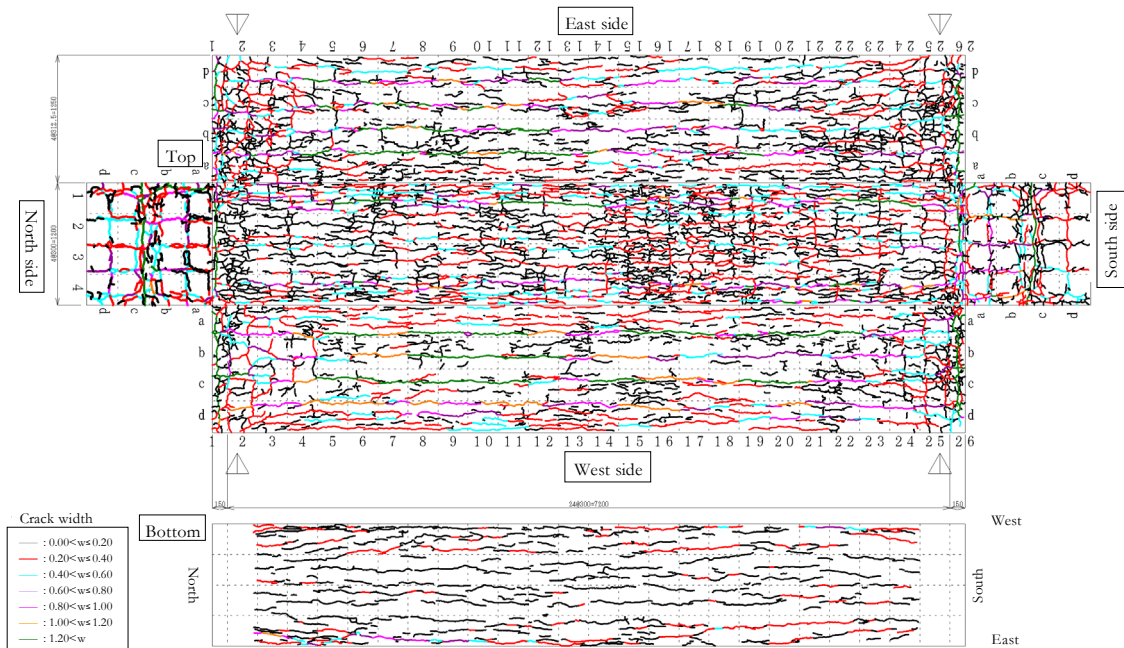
Sketch drawing of cracks observed in the large ASR specimen before the loading test
